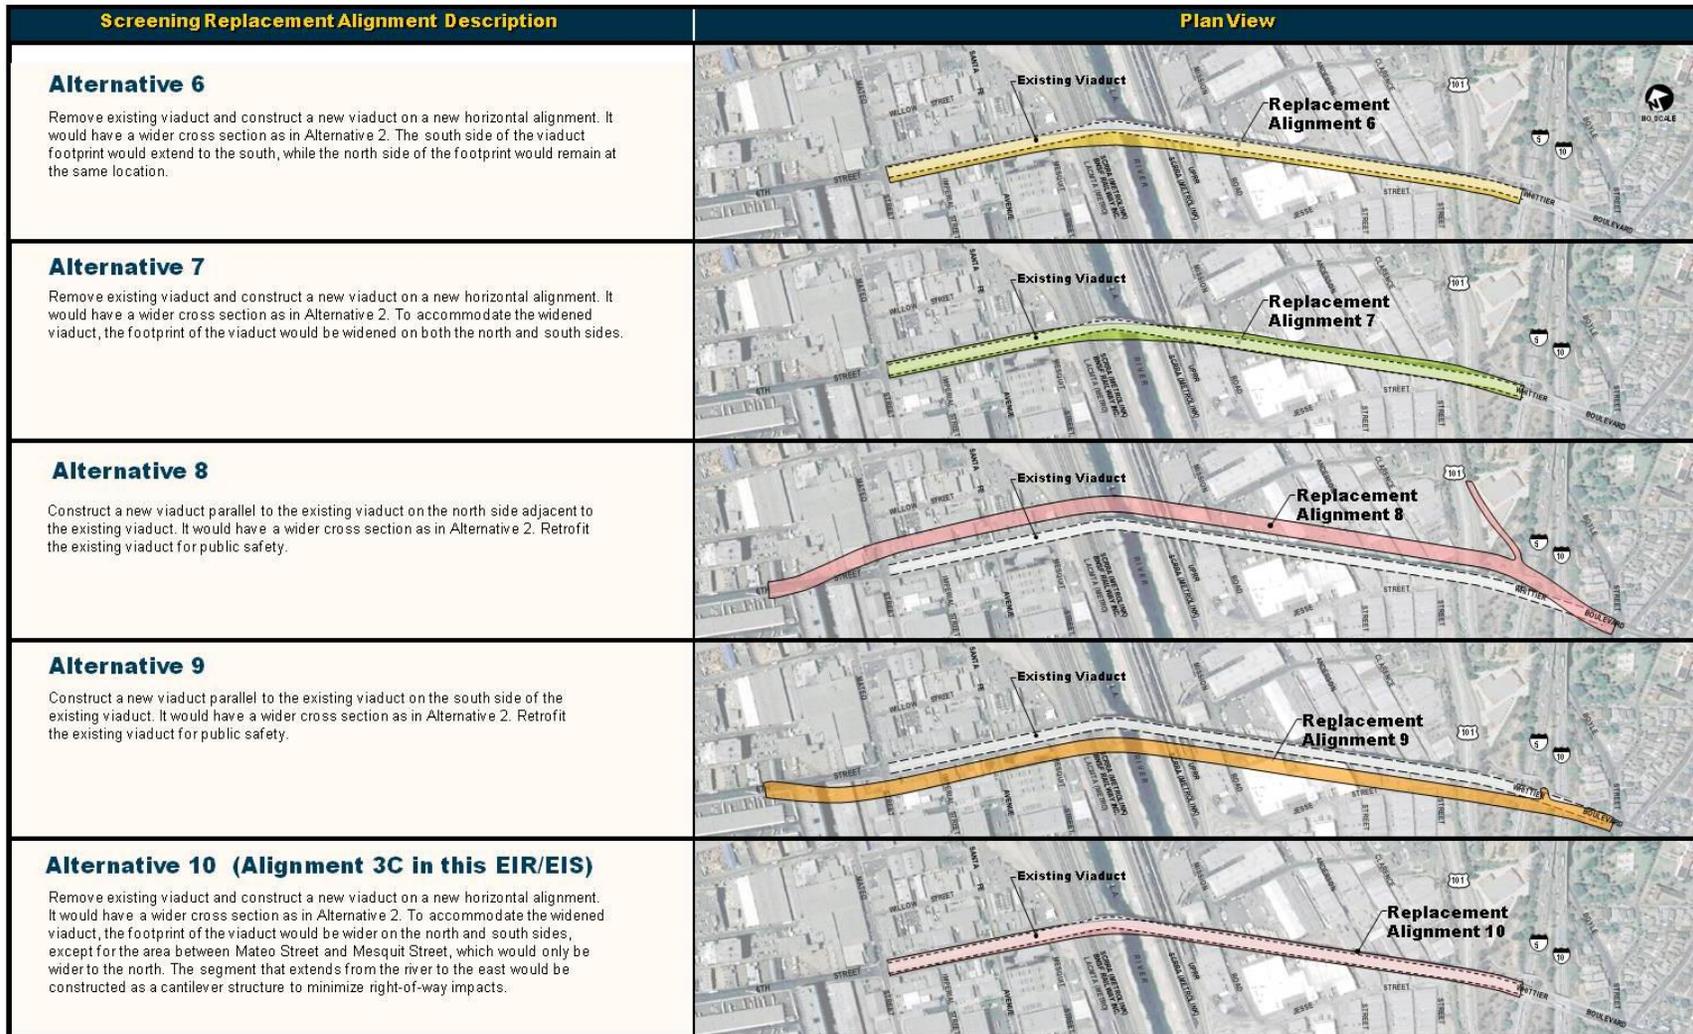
Replacement Alternative Alignment, Sheet 2
